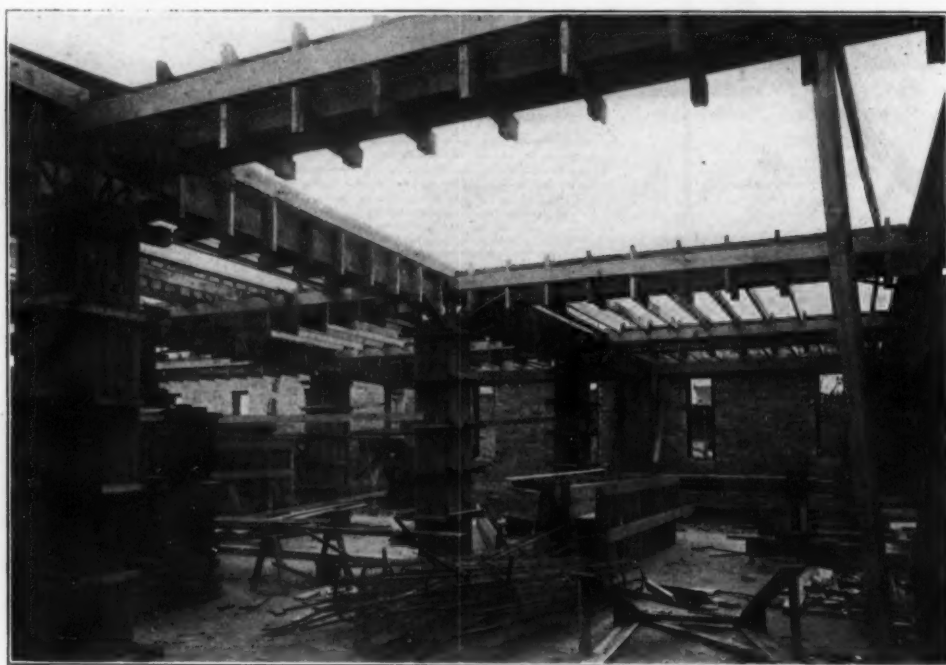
View Showing Forms for Inclosing Grills for Beams, Girders, &c.
